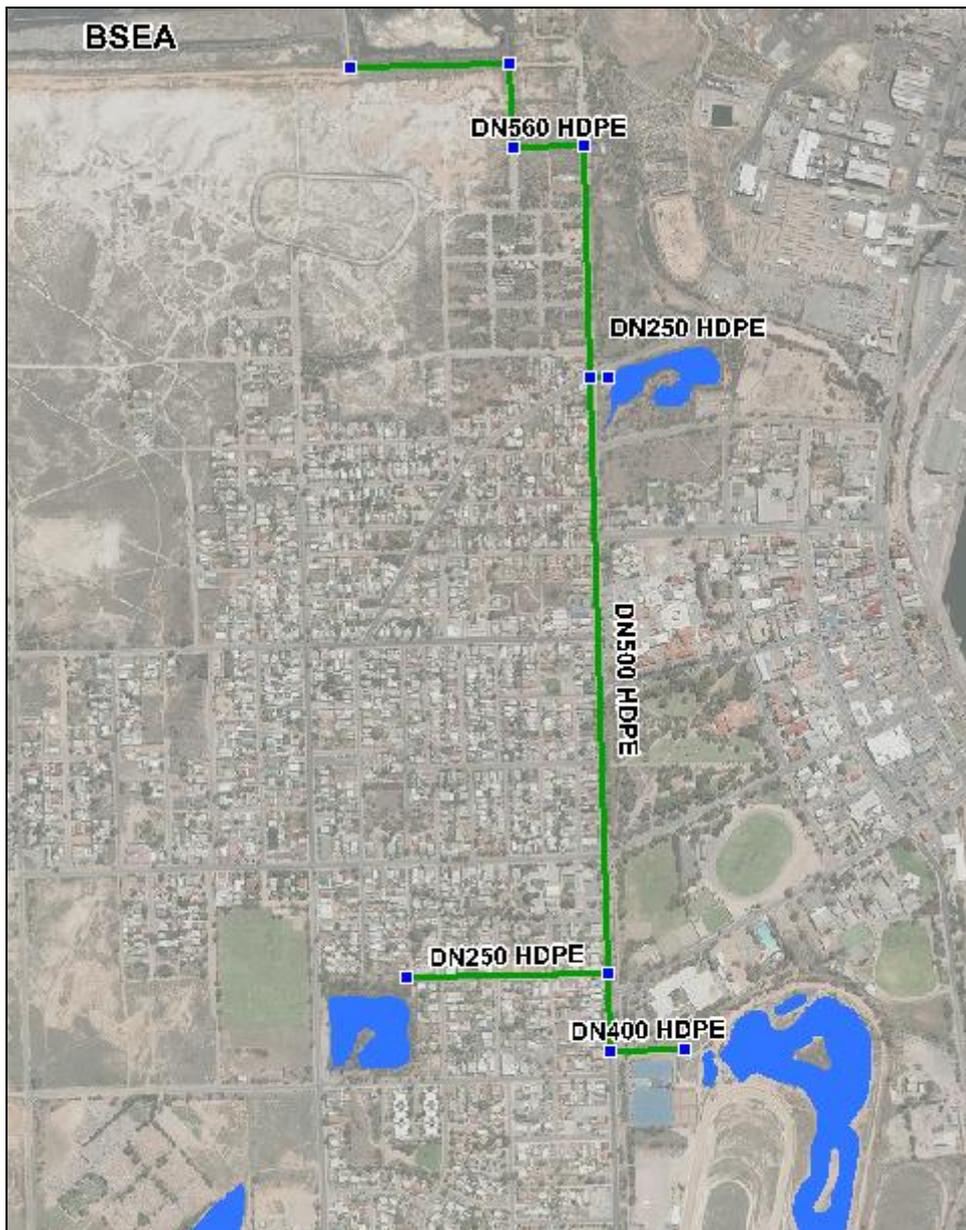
Proposed Stormwater Harvesting Alignment & Recommended Pipe Sizes
